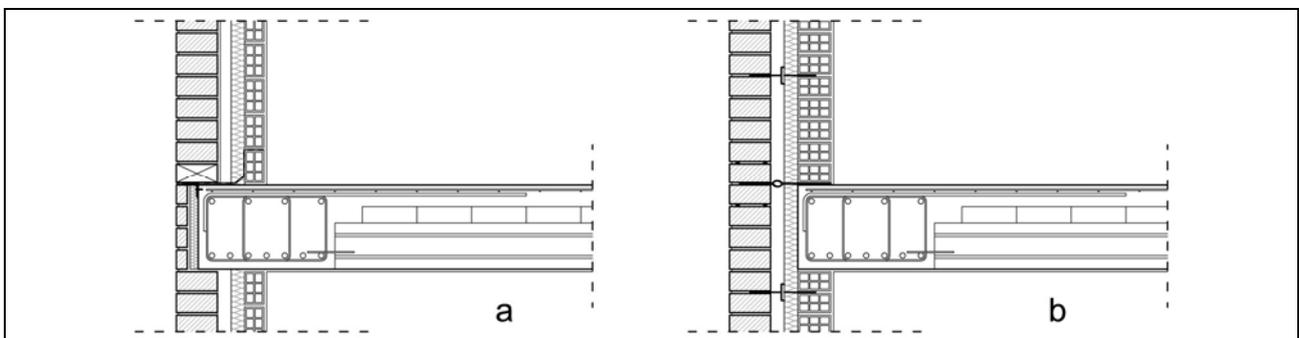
Conventional facade (a) and self-supporting facade (b).
